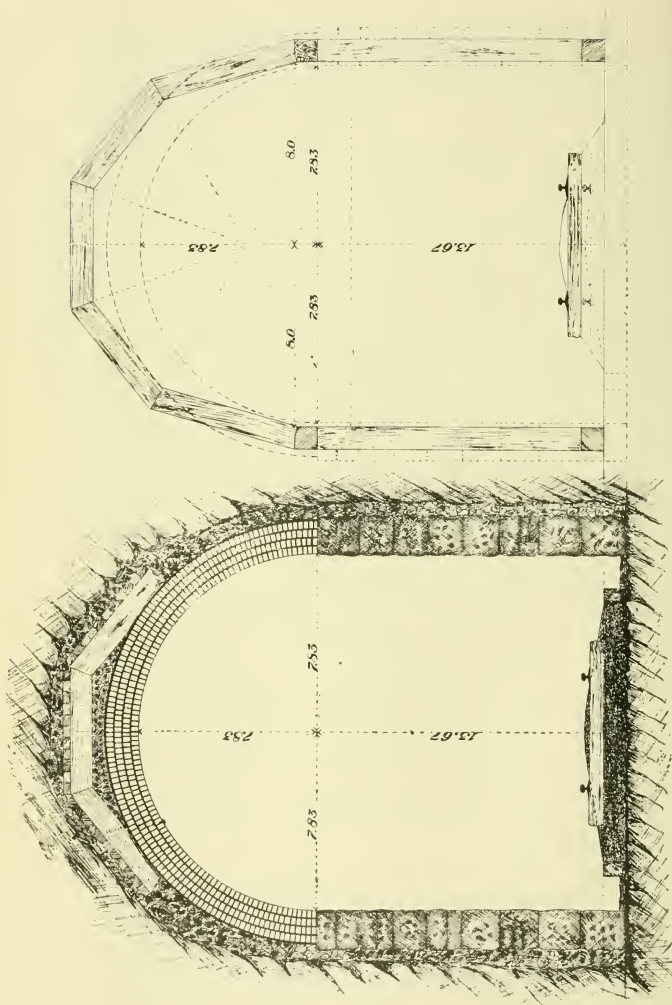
PLATE VII.—Plan of Masonry. Adopted October 24, 1891.
